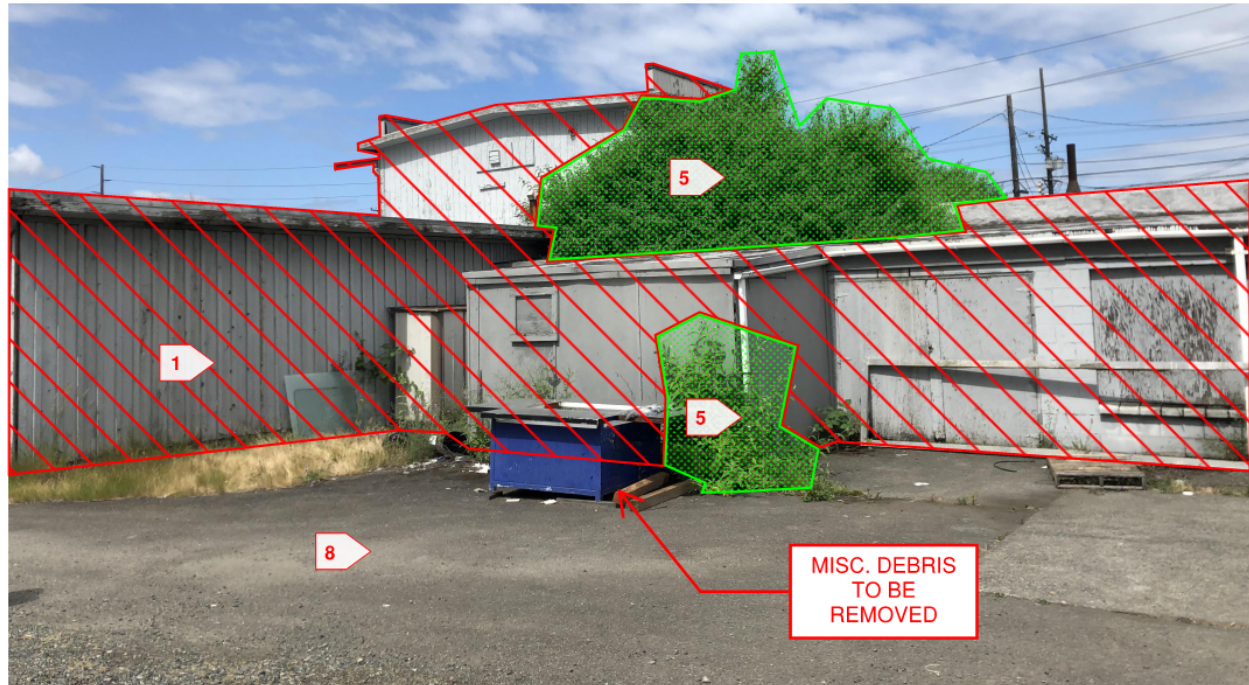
2338 E 11th Street Building Demolition Exterior Photograph
